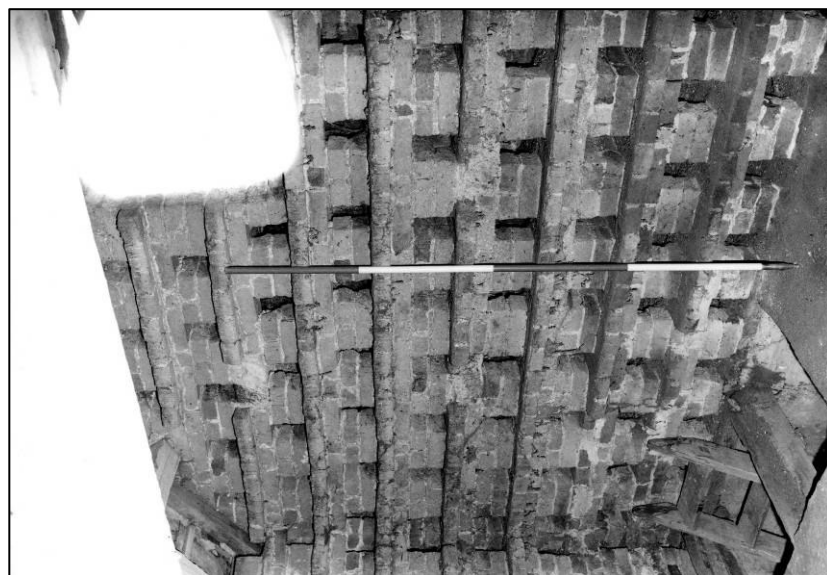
Granary: 2F pigeon loft, S wall, looking S (photo 4/10) (top to left).
